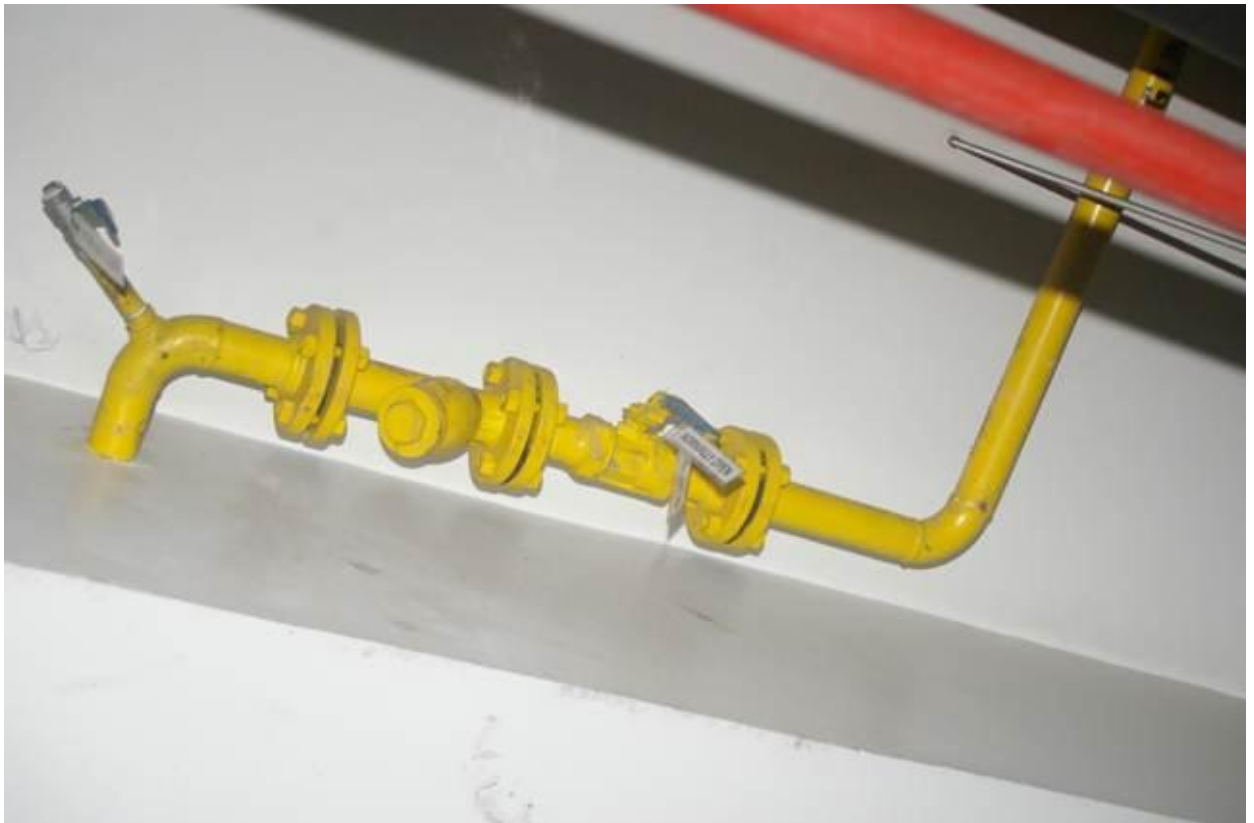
Tower BA riser penetrating basement 1 ceiling to ground floor outside Unit 101B
